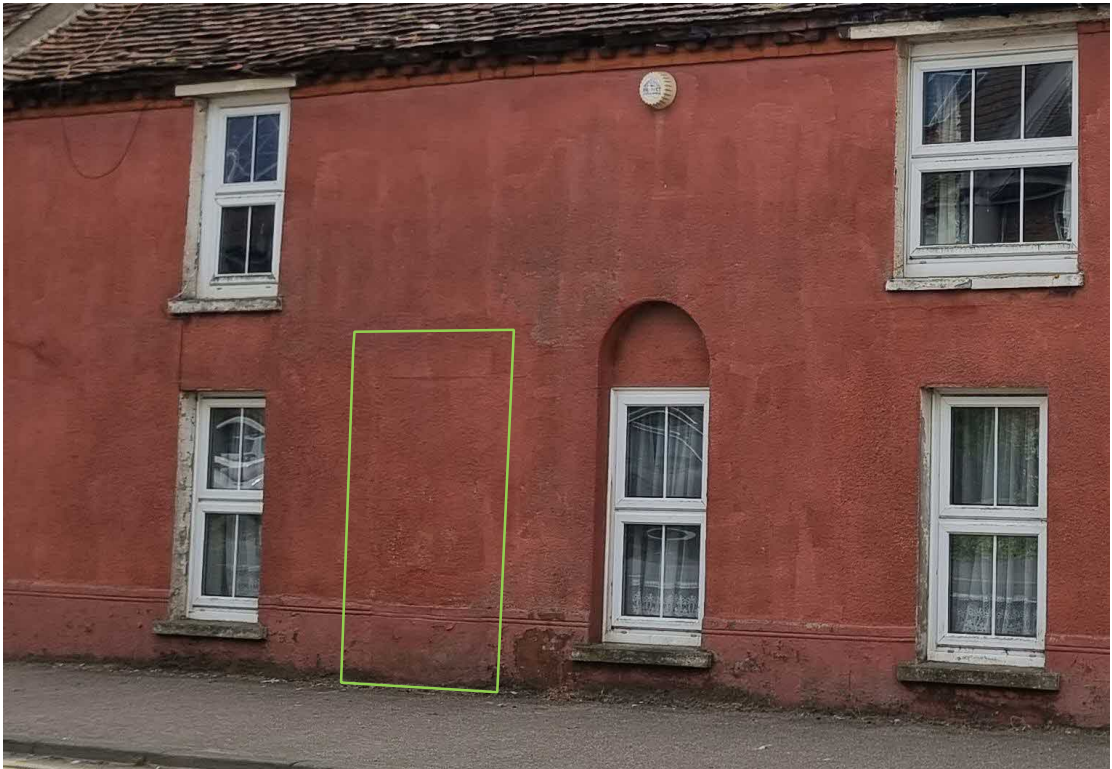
Northwest elevation fronting High Street shows the cills to ground floor windows have been lowered and the green box denoted a former doorway has been infilled.
